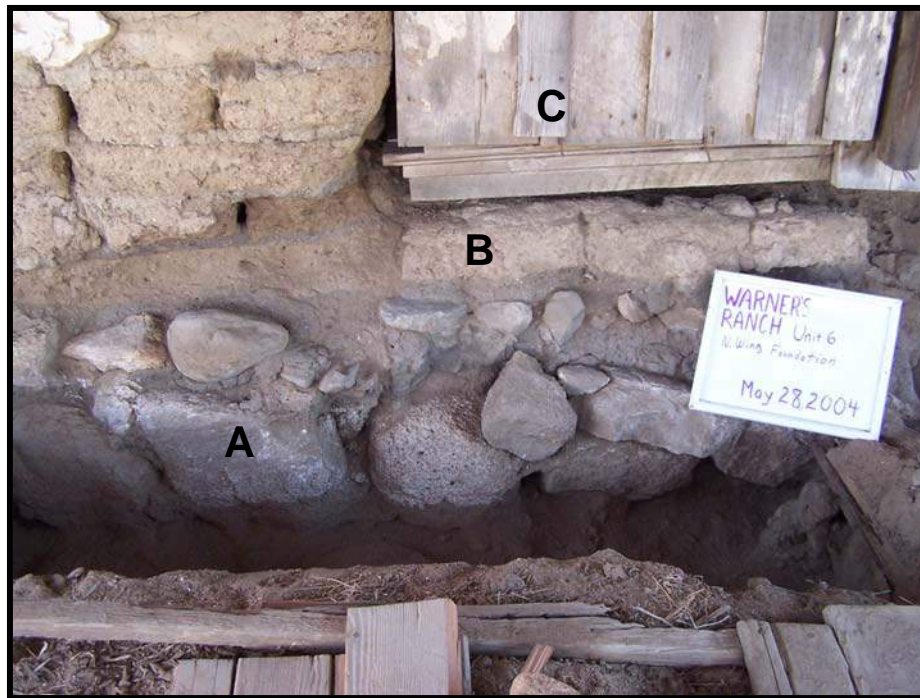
The stone foundation (A) and the bottom course of the original adobe wall (B) in Unit 04-6 underlying the north wall wooden infill (C) of Room 107.
